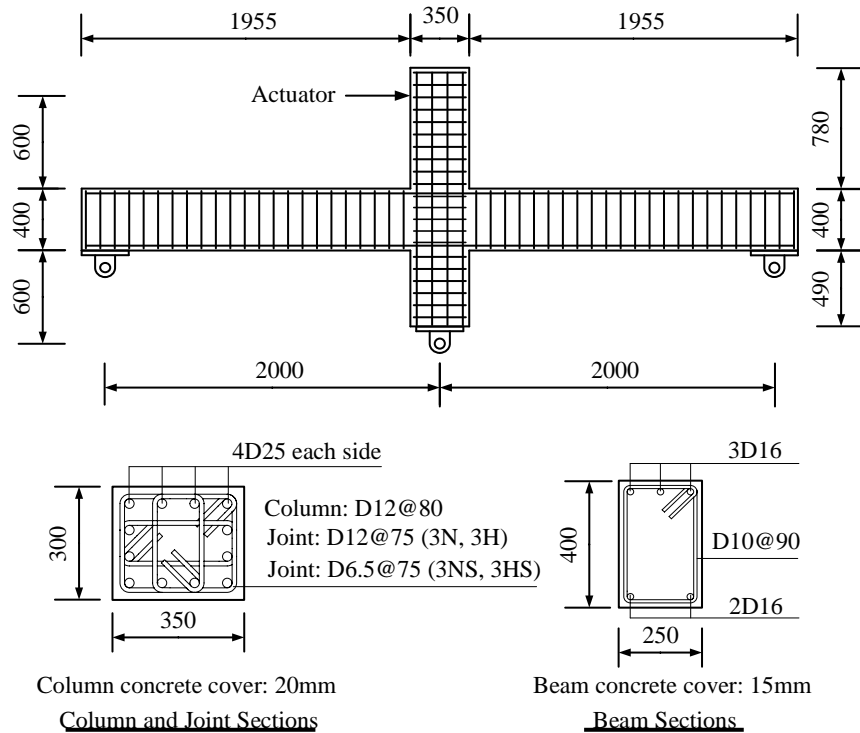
Dimensions (in millimeters) and reinforcing details of test specimens.
